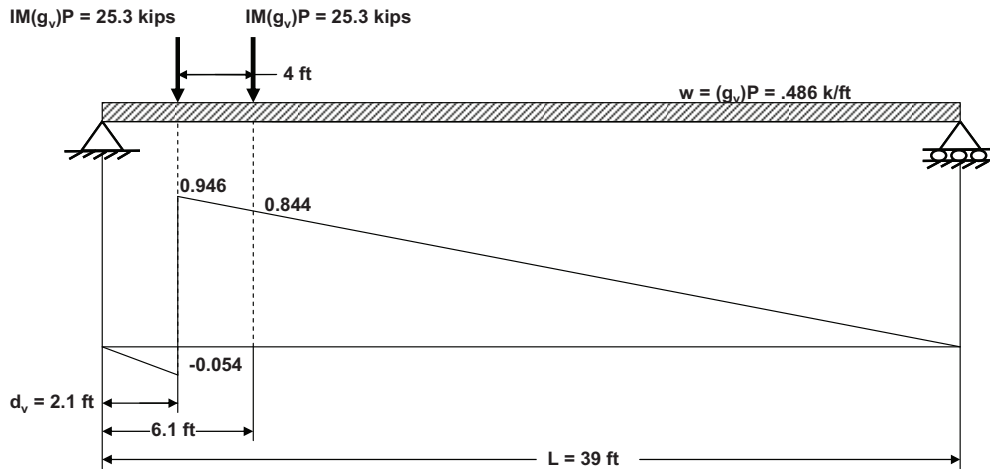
Interior Beam Shear Design Tandem at  $d_v$
